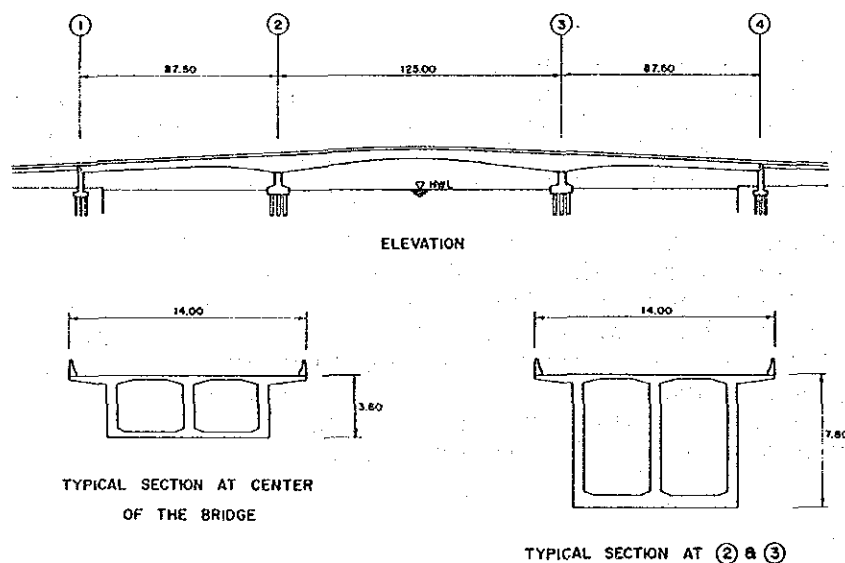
Typical Sections of PC 3-Span Continuous Box Girder Type Bridge
